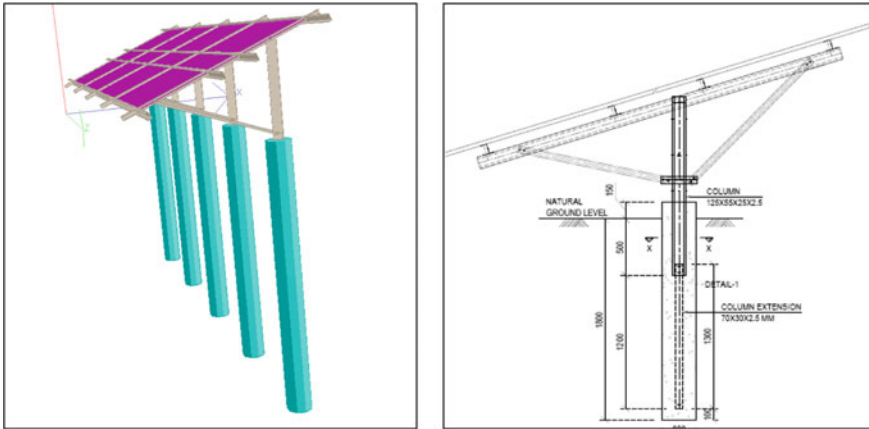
MMS table with foundation: 3D rendered view on left photo and sectional view on right
